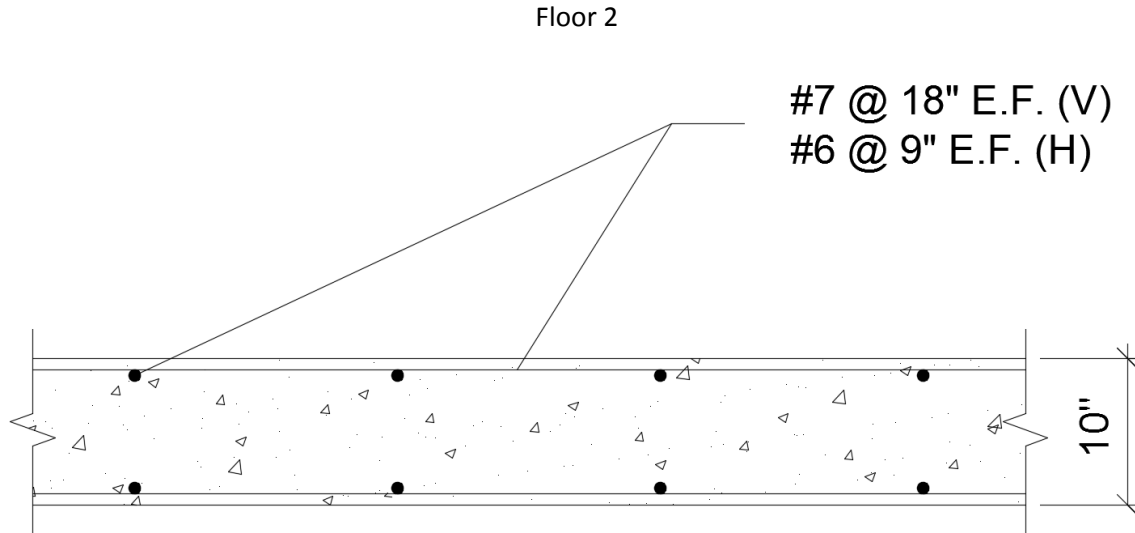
Segment of exterior wall cross-section at the 2nd floor level based on SDC D design.
